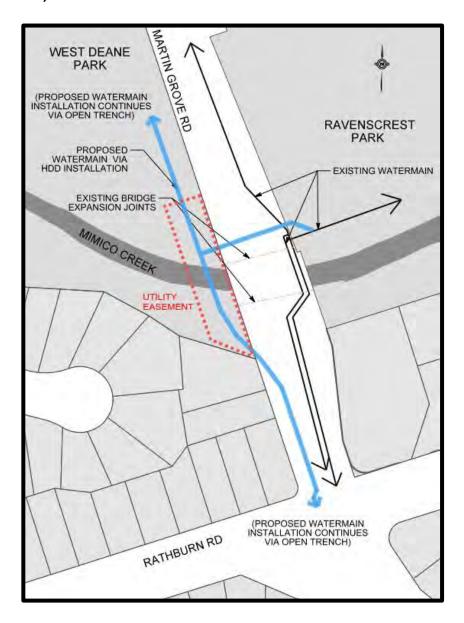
Alternative #3: Watermain aligned west of Martin Grove Road / Bridge
